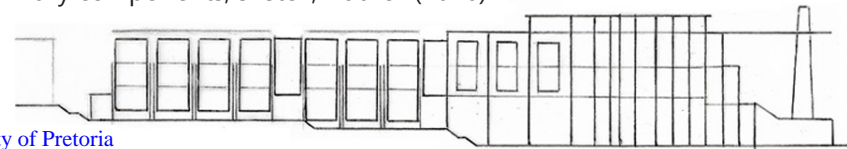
Secondary components, Brick Tongjiang Recycled brick school, archdaily.com (2016)
